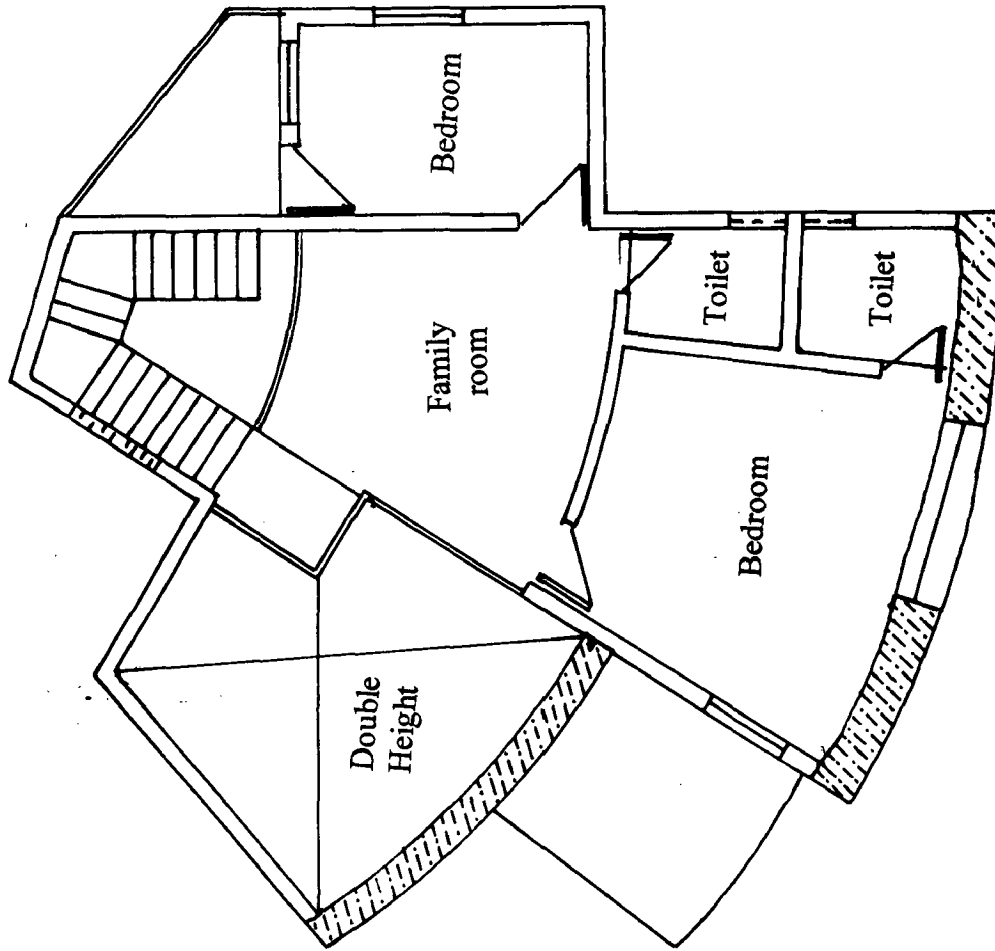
Floor Plans: Antony's House, Scale 1:100
